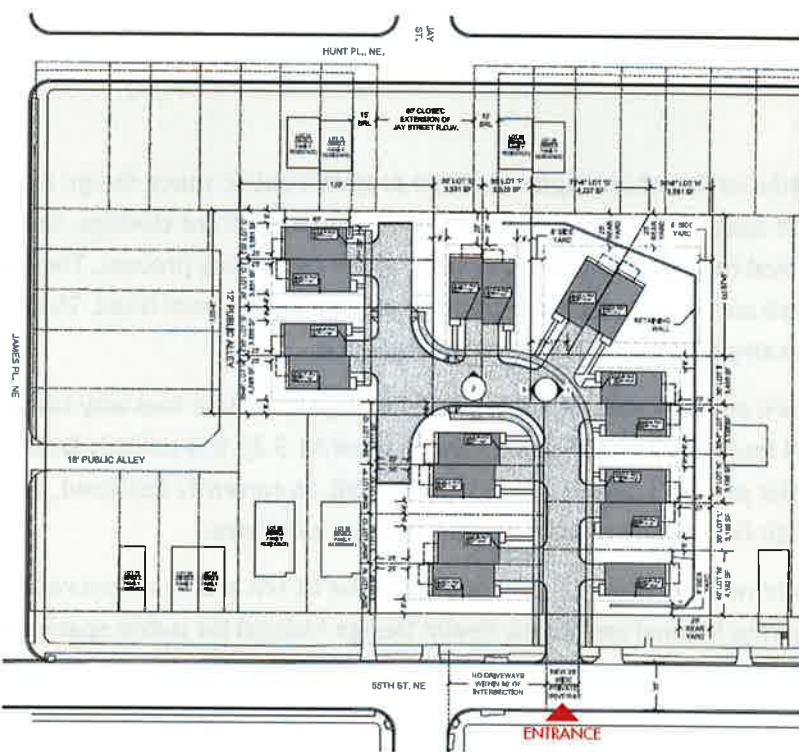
Proposed Site Plan (Source: Architectural Plans and Elevations, Sheet 6, undated)
